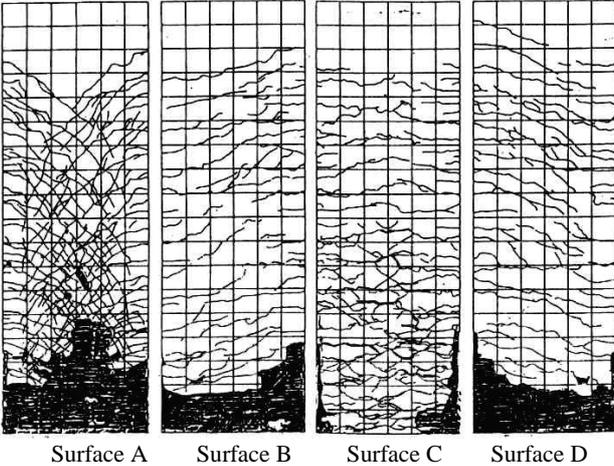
Cracking and spalling of the specimen after loading (10 cm per box)
